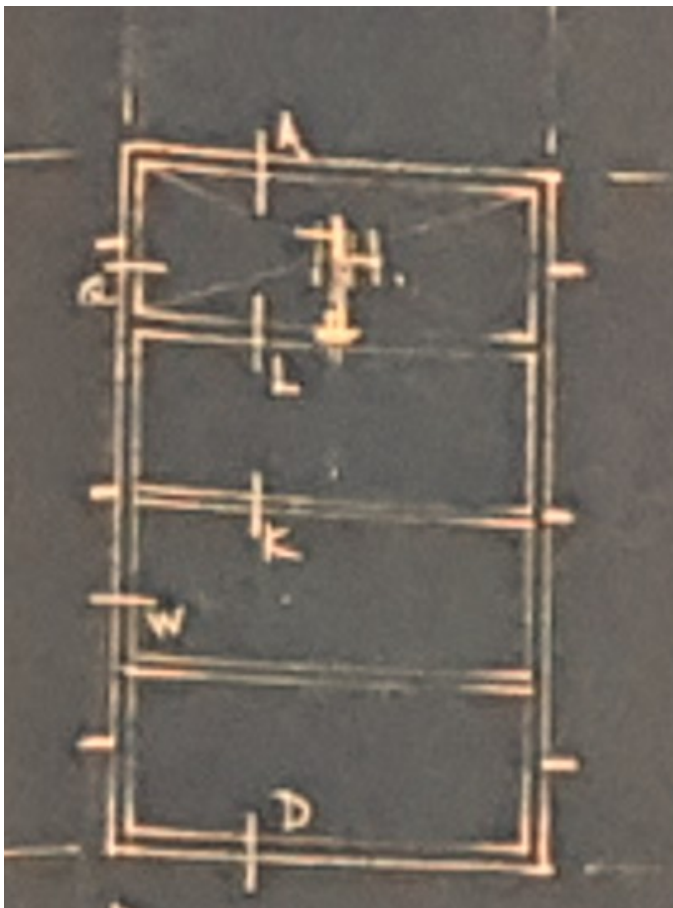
Extract of original windows drawings, showing one window type and the glazing bar as Section K.
